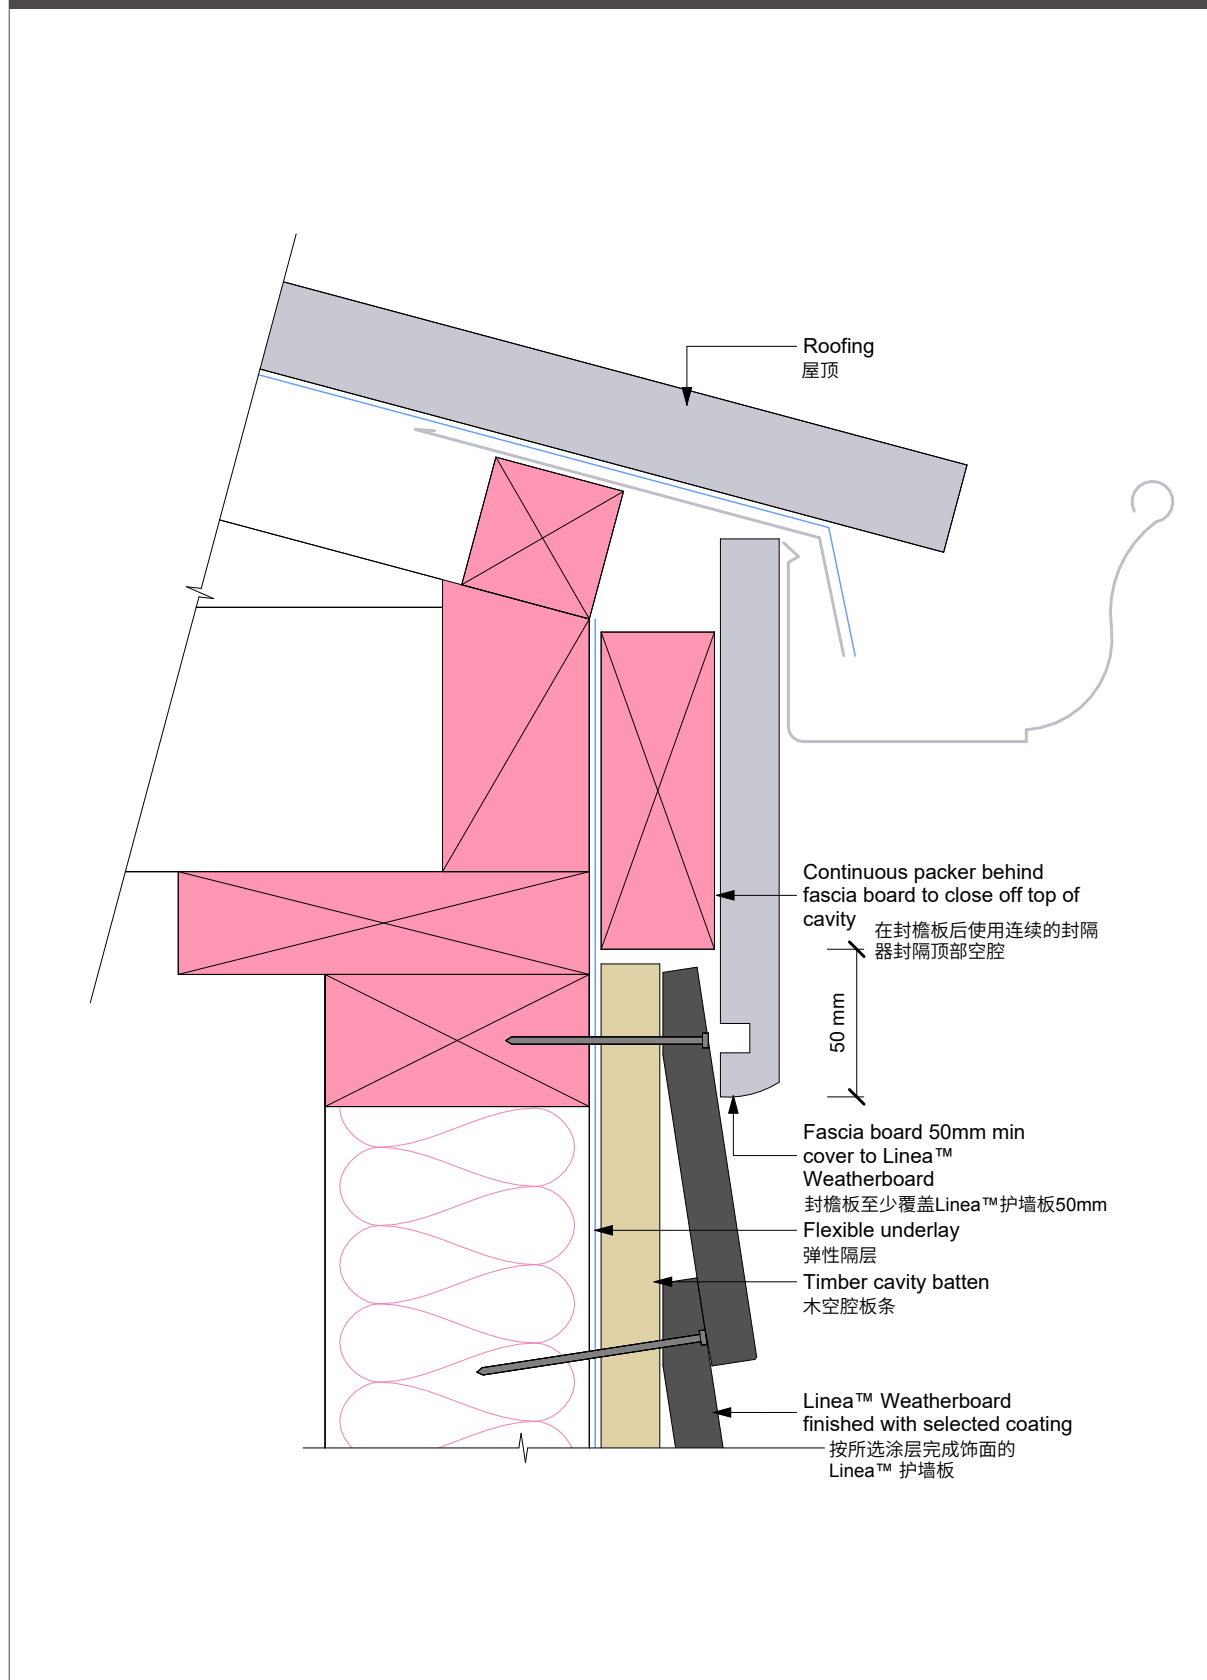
Sloping soffit and wall junction | 图16: 倾斜拱腹与墙体连接
